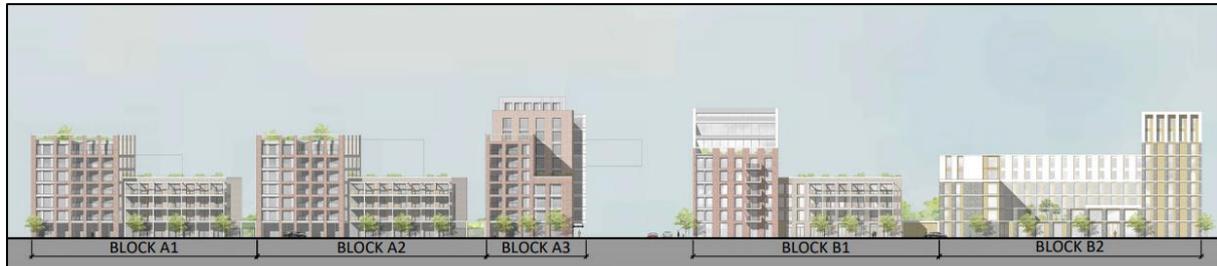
South contextual elevation of development proposed under An Bord Pleanála Case No. 303306
